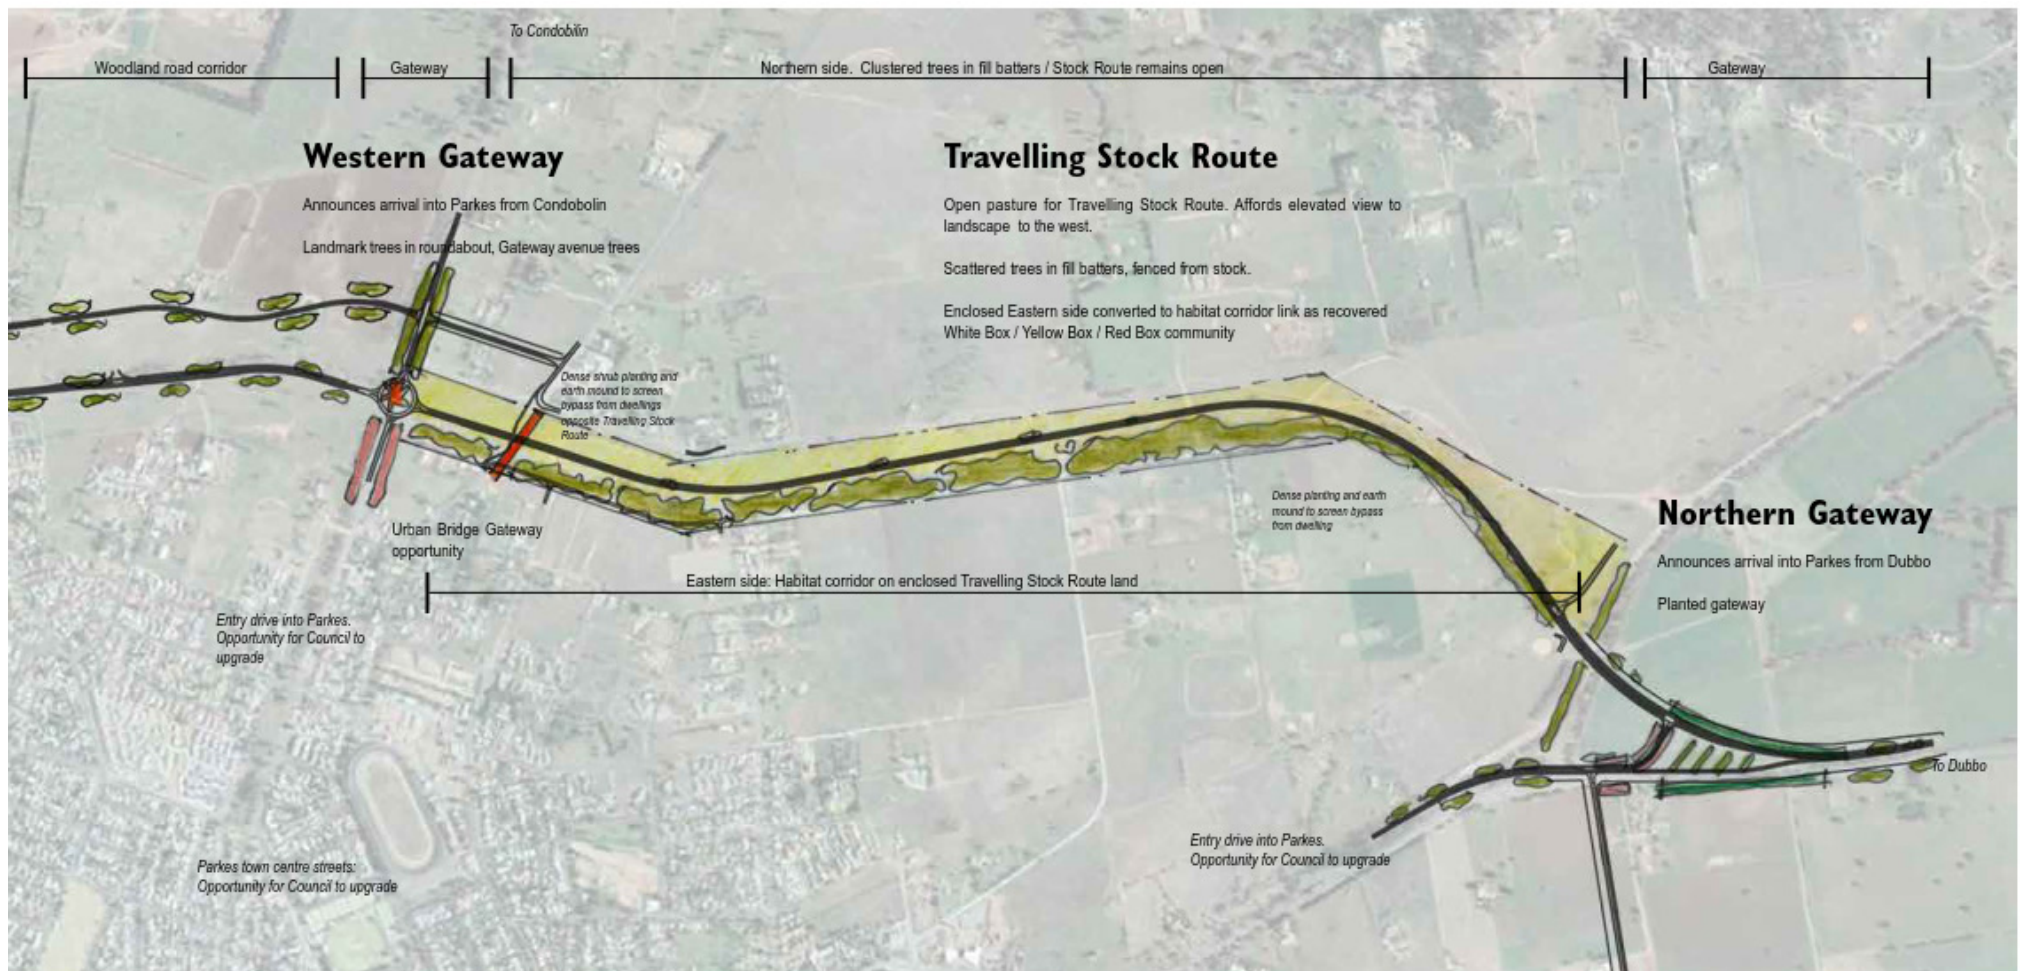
and Figure 3-4 show the landscape concept plan for the proposal.
